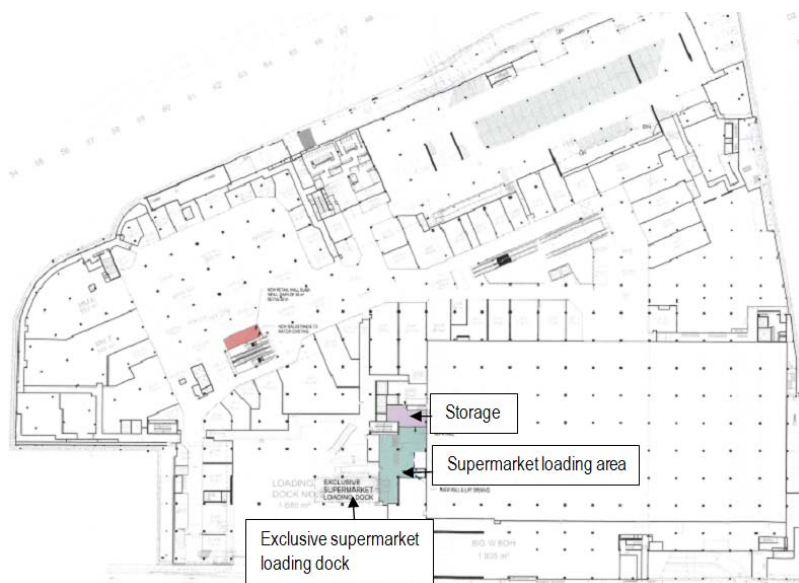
Proposed Lower Ground Level of the Shopping Centre.
